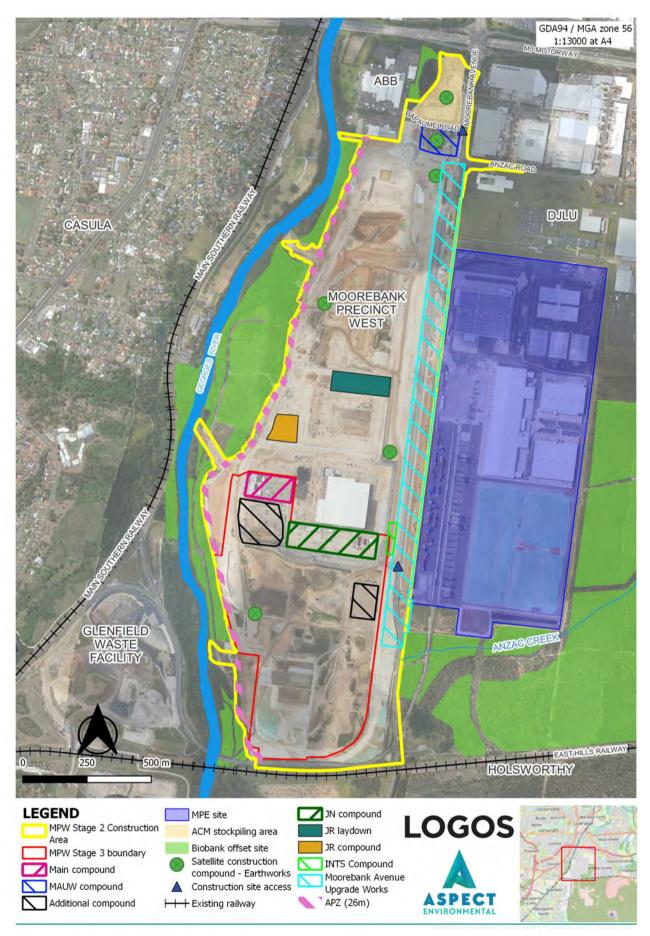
MPW Stage 2 indicative construction compounds and site access
